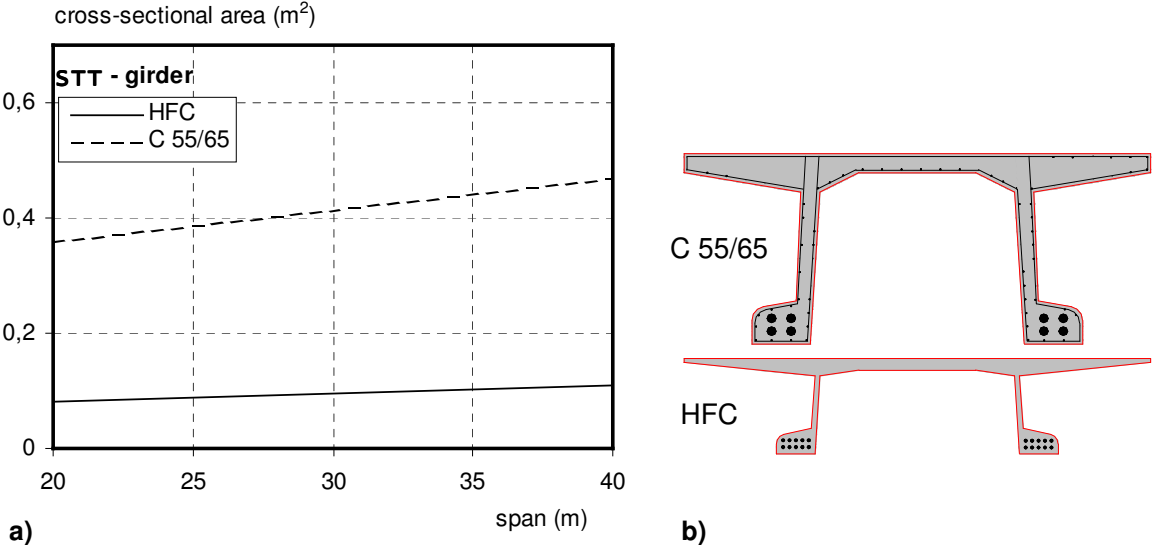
a) The relation between span and cross-sectional area of STT-girders made of Hybrid-Fibre Concrete (HFC) and of conventional reinforced concrete C 55/65; b) The scheme of the cross-sections of girders in HFC and C55/65
